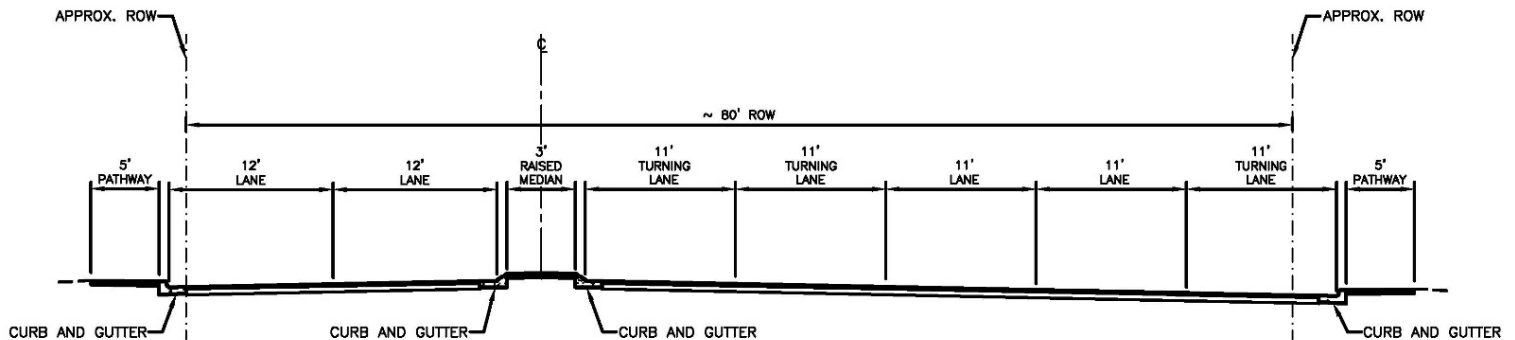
36th Avenue looking east from the west side of the Seward Highway intersection
